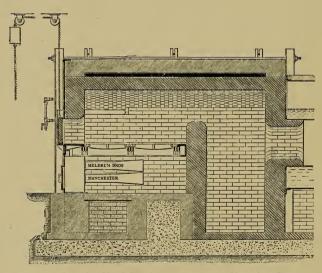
Longitudinal Section of Furnace, Showing Steam Jet Blowers; Meldrum's Destructor.
